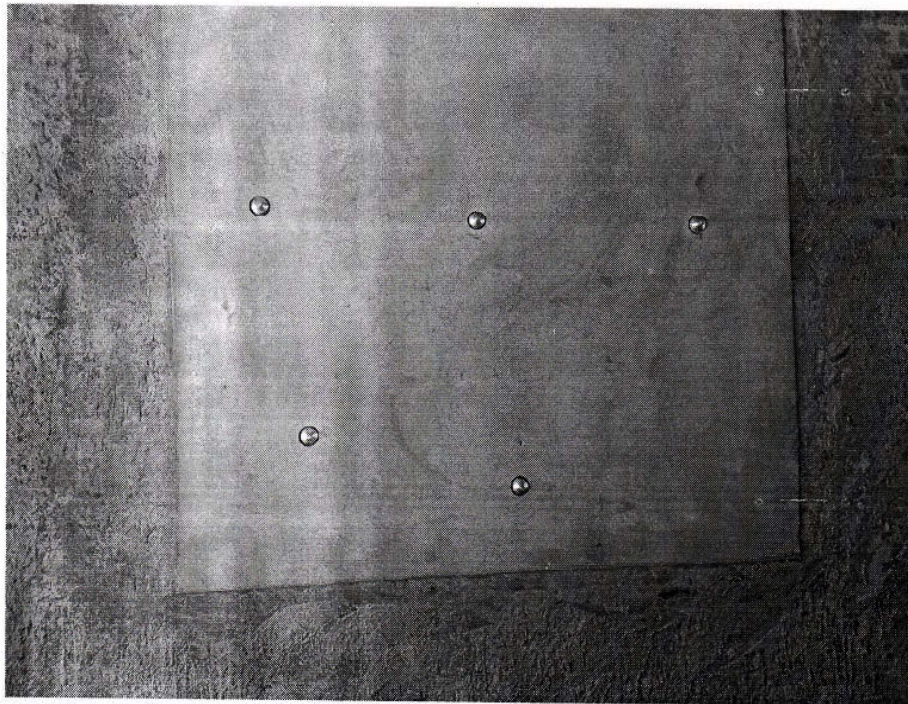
Special metal plates bonded to the in-place plaster surface on a wall
